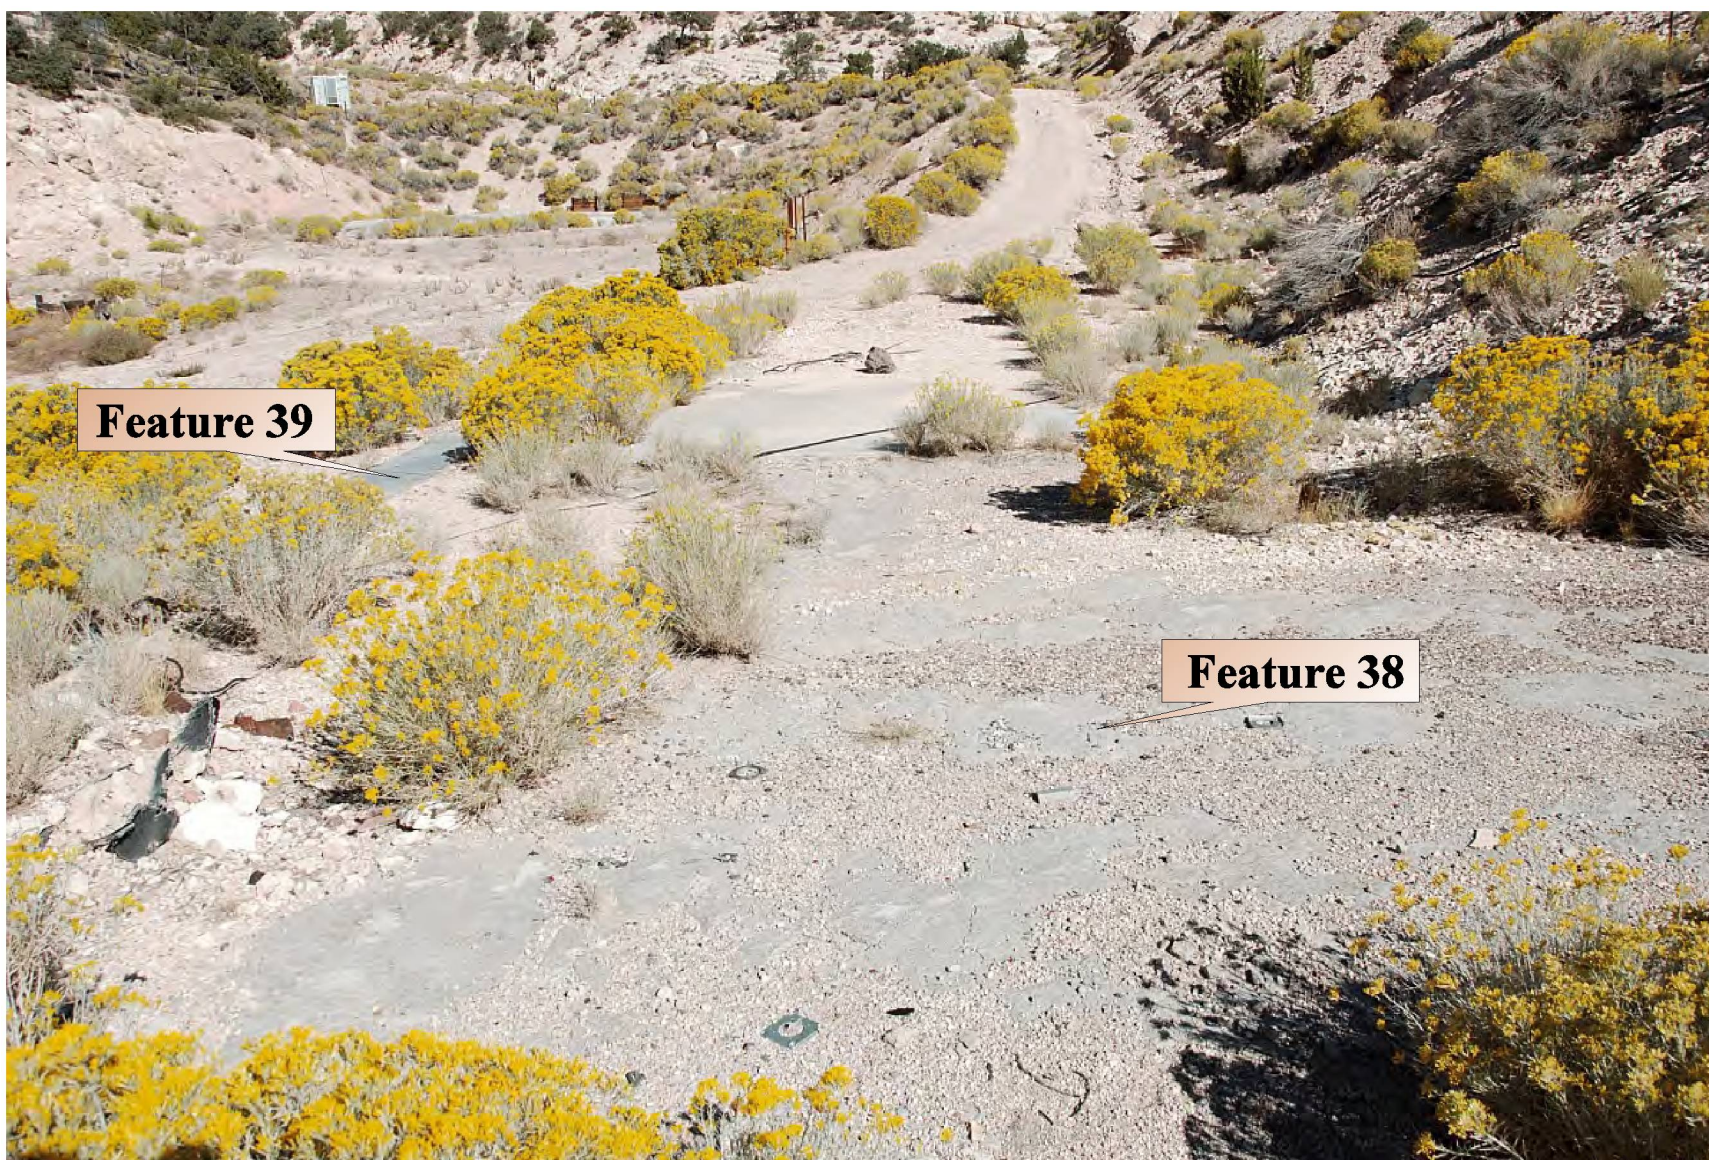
Feature 38, concrete foundation for electrical storage building and Feature 39, storm drainage channel, U12n Tunnel, view north (2008).
